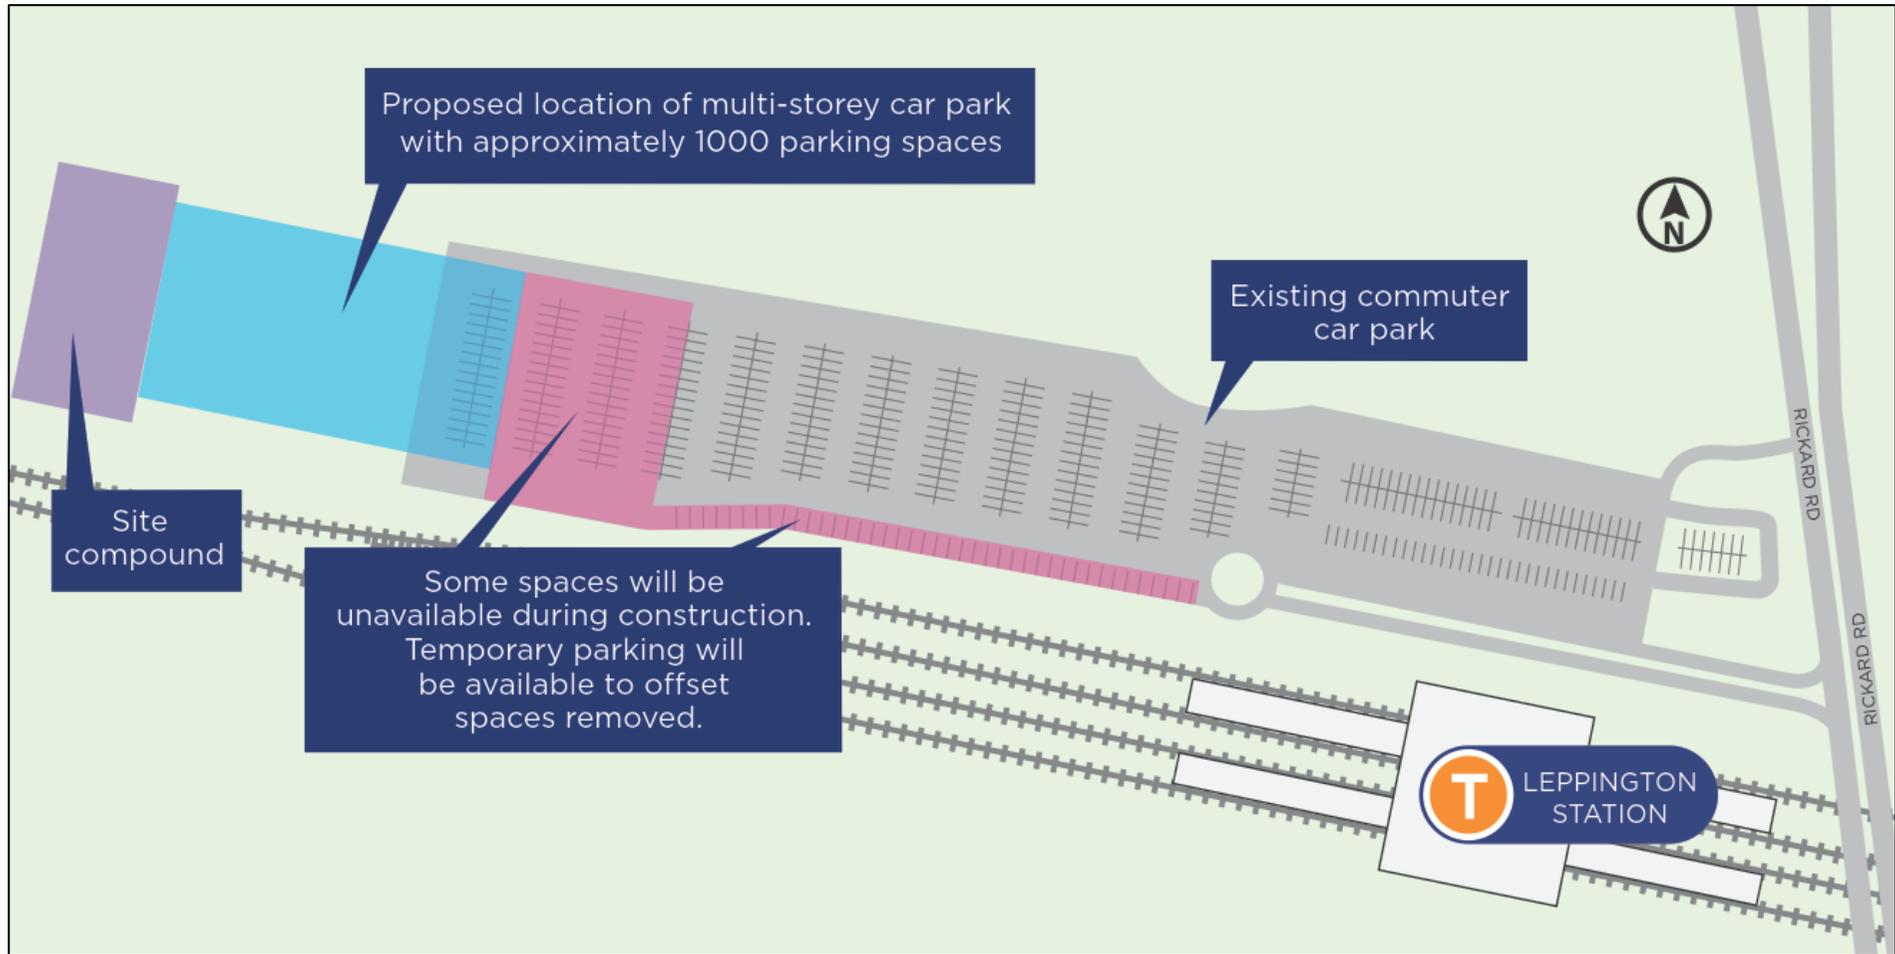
General layout of the Proposal (Indicative only and subject to detailed design).
